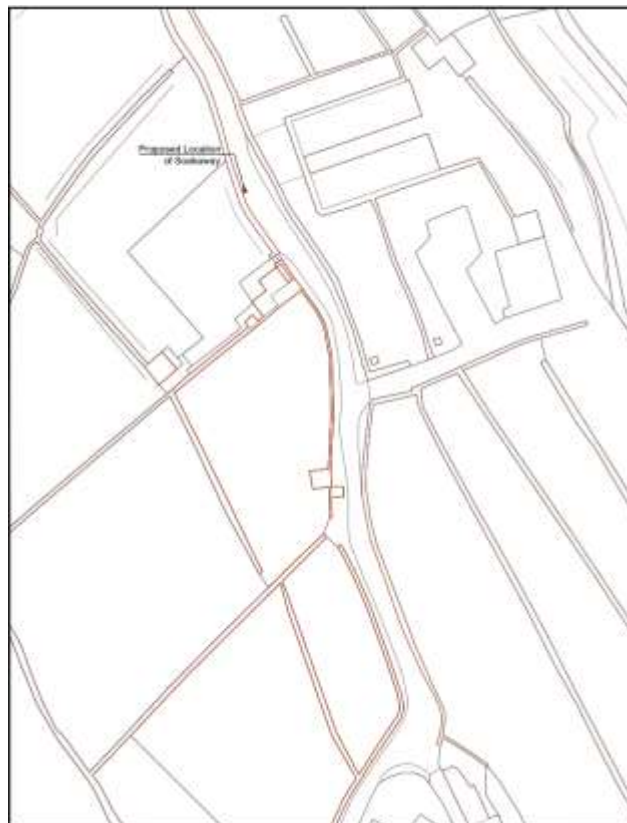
Block plan of the location for the proposed development (Source: PDS submitted directly to ERA via email on 09/07/2024)
